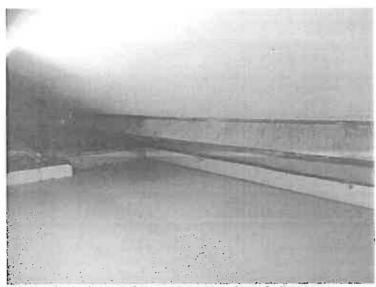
Northern elevation loft space interior – boarded to create a storage area.
